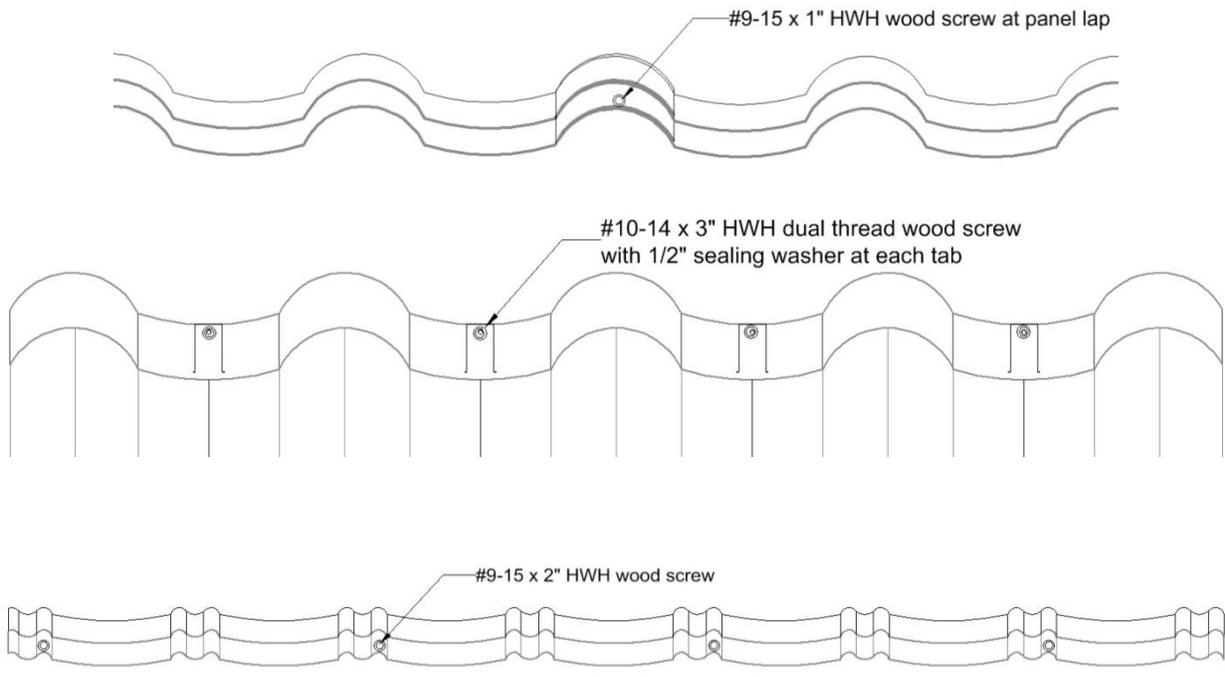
Terrabella Verona® Panels Fastened to Wood Deck
